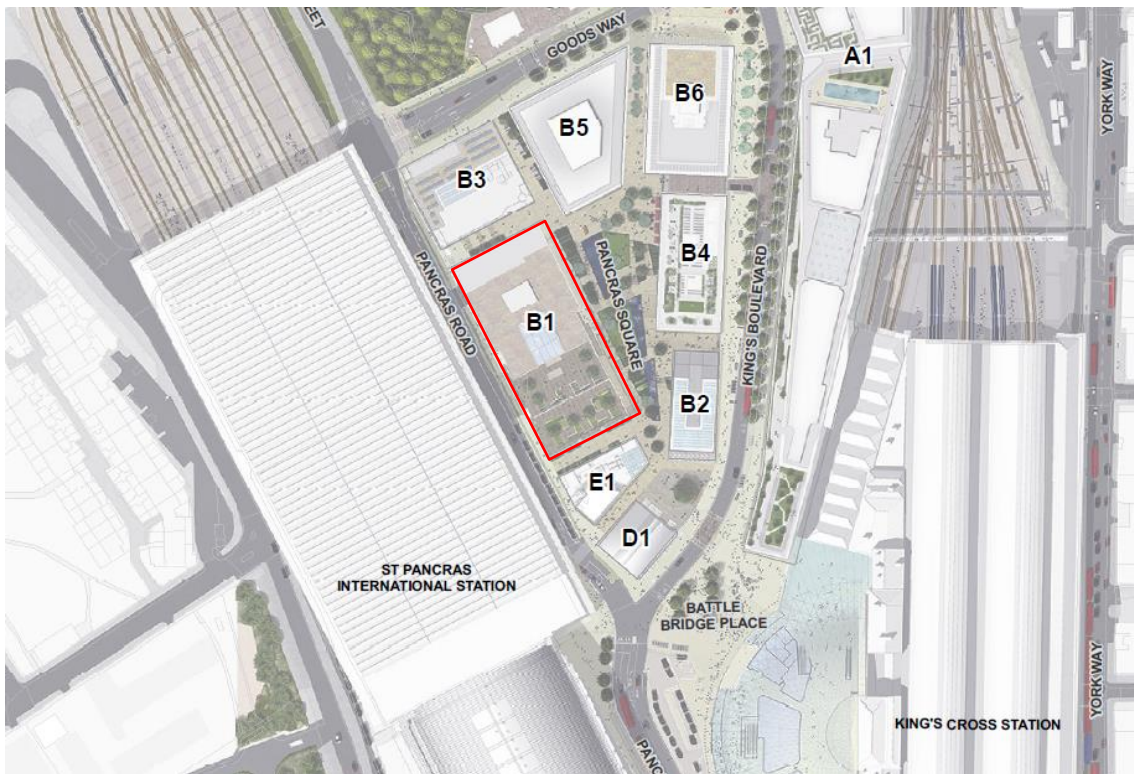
Excerpt of KCC site plan indicating location of 6PS (courtesy Kings Cross Central Limited Partnership)
